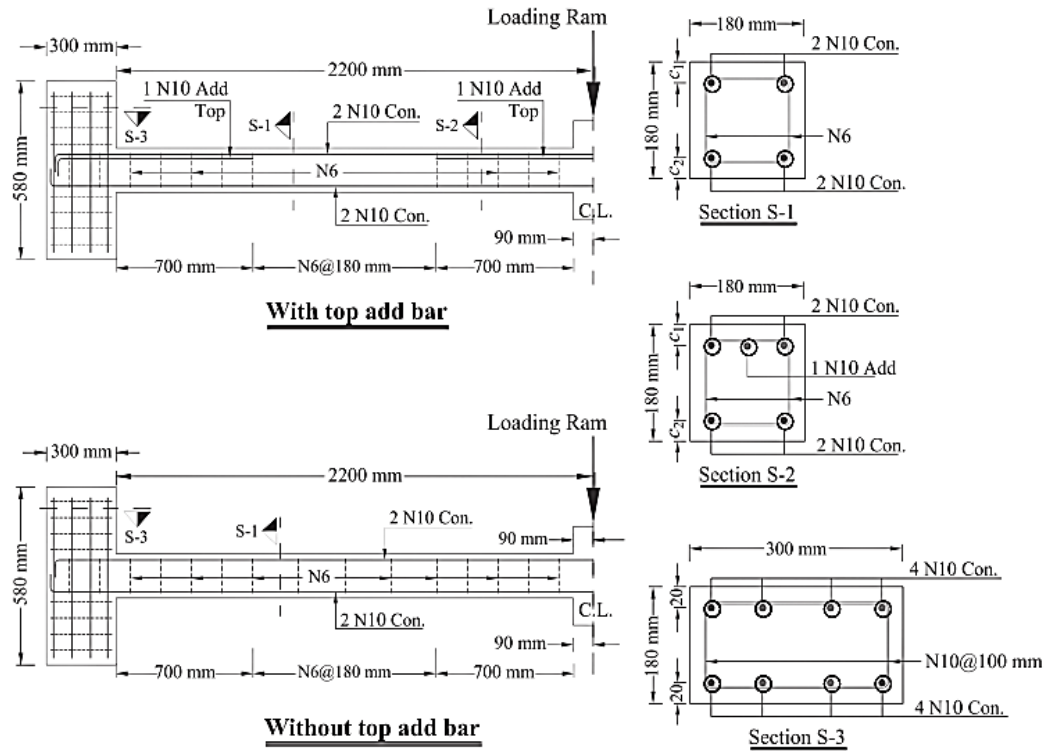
Geometric and reinforcement arrangement of the test specimens (Vesali et al. 2013)
